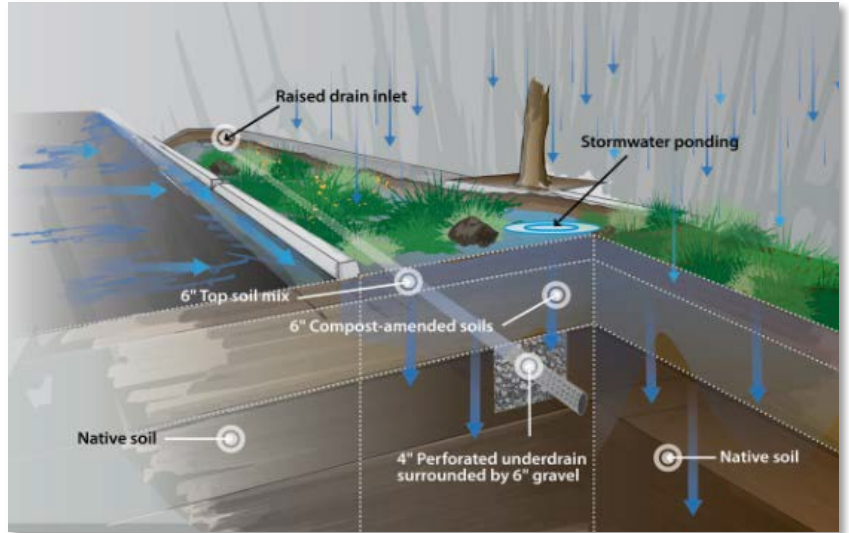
Figure B: CA State University-Sacramento Generic Urban Infiltration Trench BMP Detail
